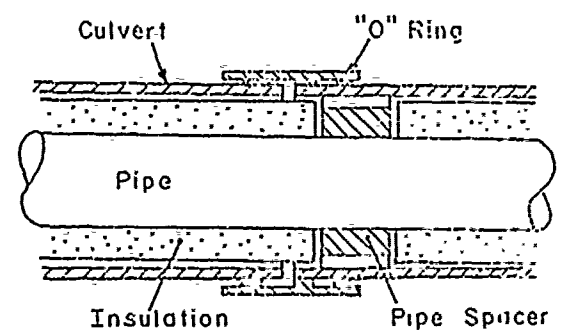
Details of pipe spacers, wall connections and couplings for asbestos cement pipes.
